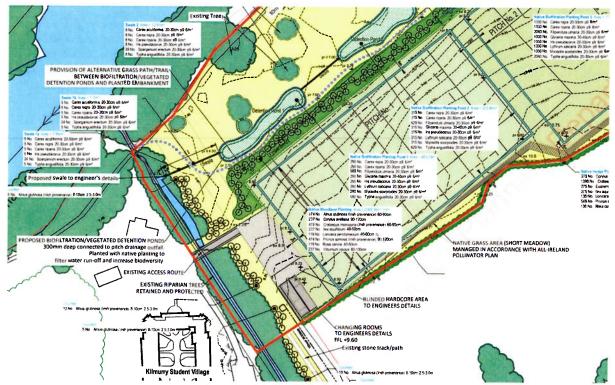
Layout of the permitted rugby pitch to the east of Kilmurray Village, the Horticulture building and University Road (CH300_C-CH677_C)
